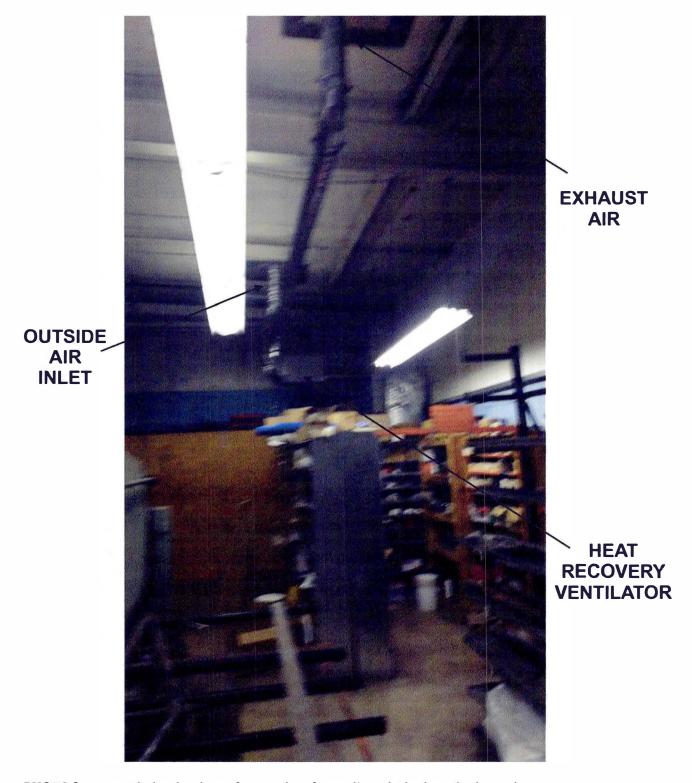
Ductwork showing the roof penetrations for ventilator the intake and exhaust air.
